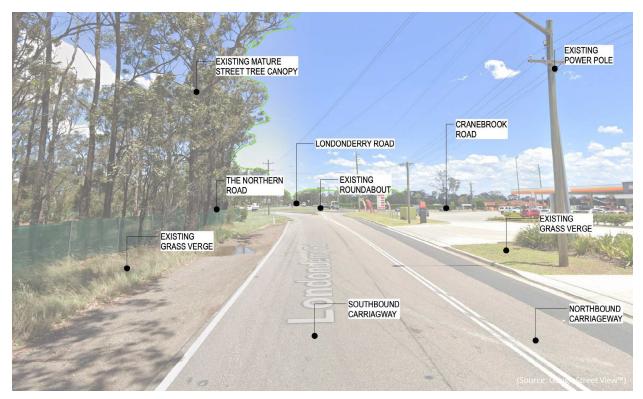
Viewpoint 4 - Intersection of Londonderry Road with The Northern Road and Cranebrook Road (facing south west
